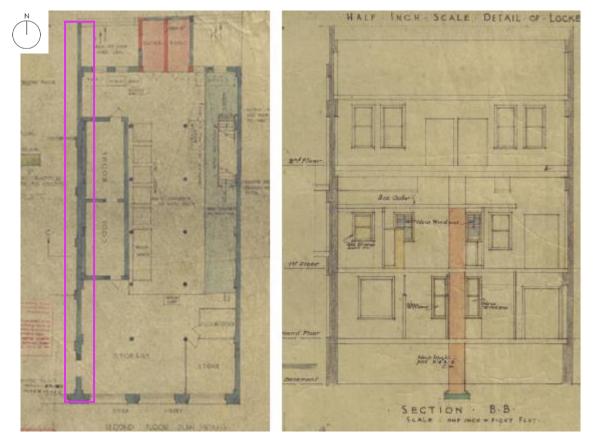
1942 alteration/ repairs historical second floor plan (left) and cross section (right) of 355 Sussex Street (Source: Heritage Impact Statement prepared by Urbis, City of Sydney Archives DA/470/42). Northern party wall of 357 Sussex Street shown outlined in pink.
